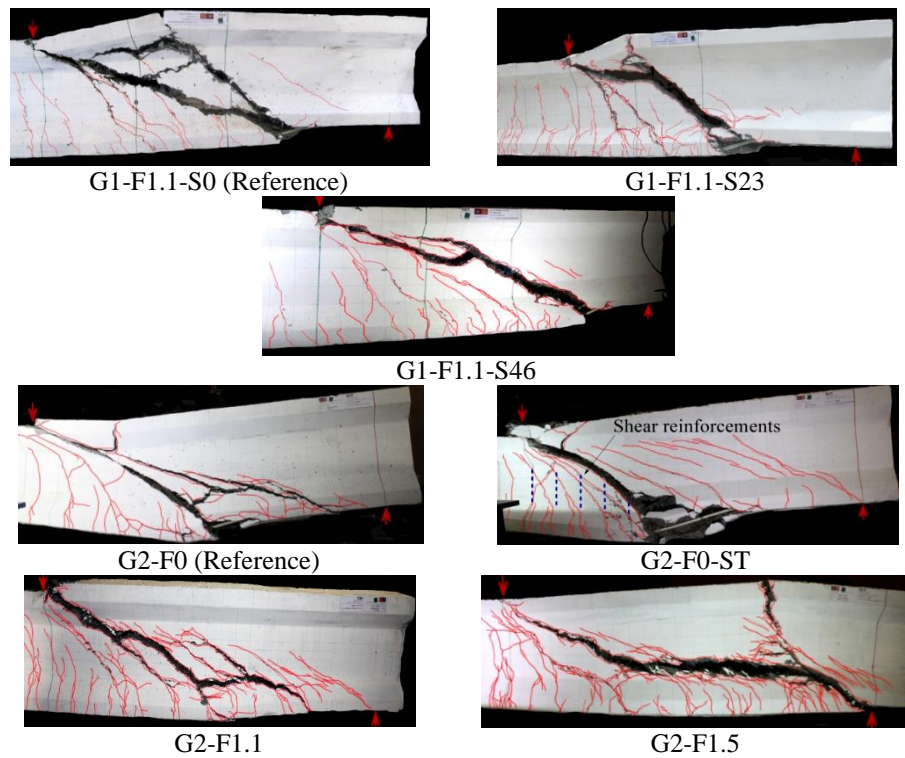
Crack pattern at failure of the first and second group of beams (Soltanzadeh et al., 2016b).
